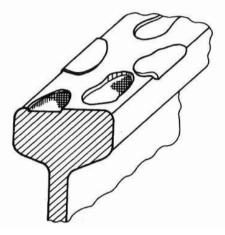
Schematic of the surface of the rail head damaged in spalling
